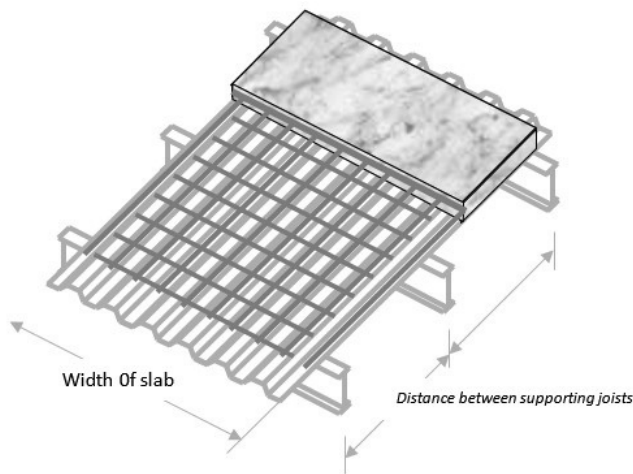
Erection of steel reinforcement and pouring of concrete
